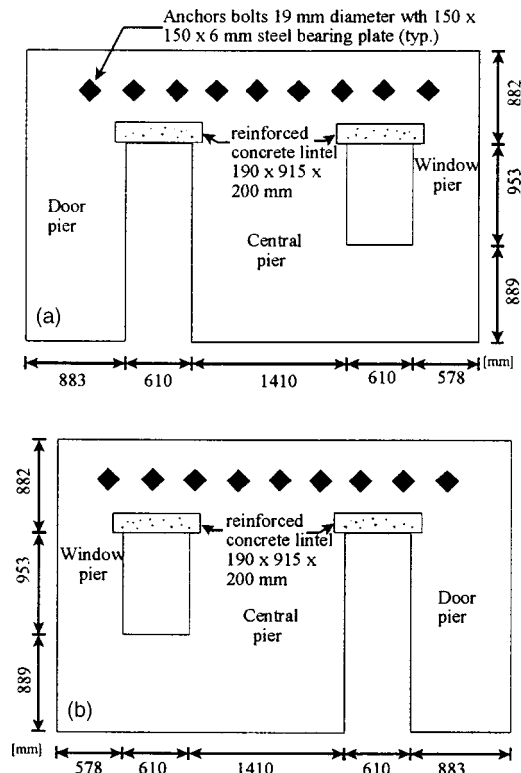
Elevation of unreinforced masonry specimen (parallel to loading): (a) east wall and (b) west wall
